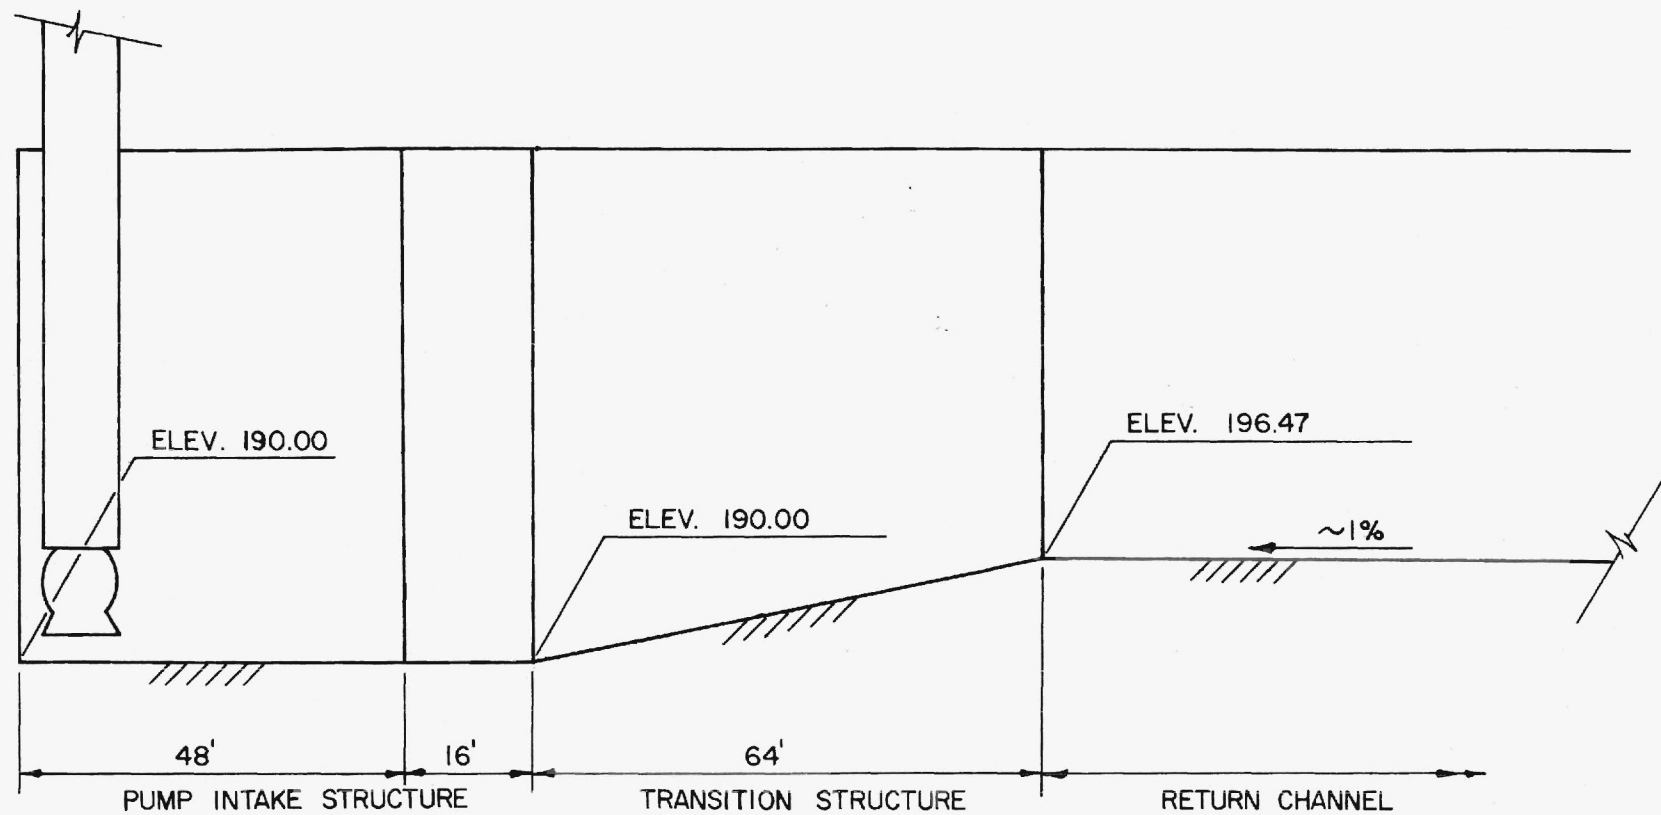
ELEVATION VIEW OF HYDRAULIC MODEL
